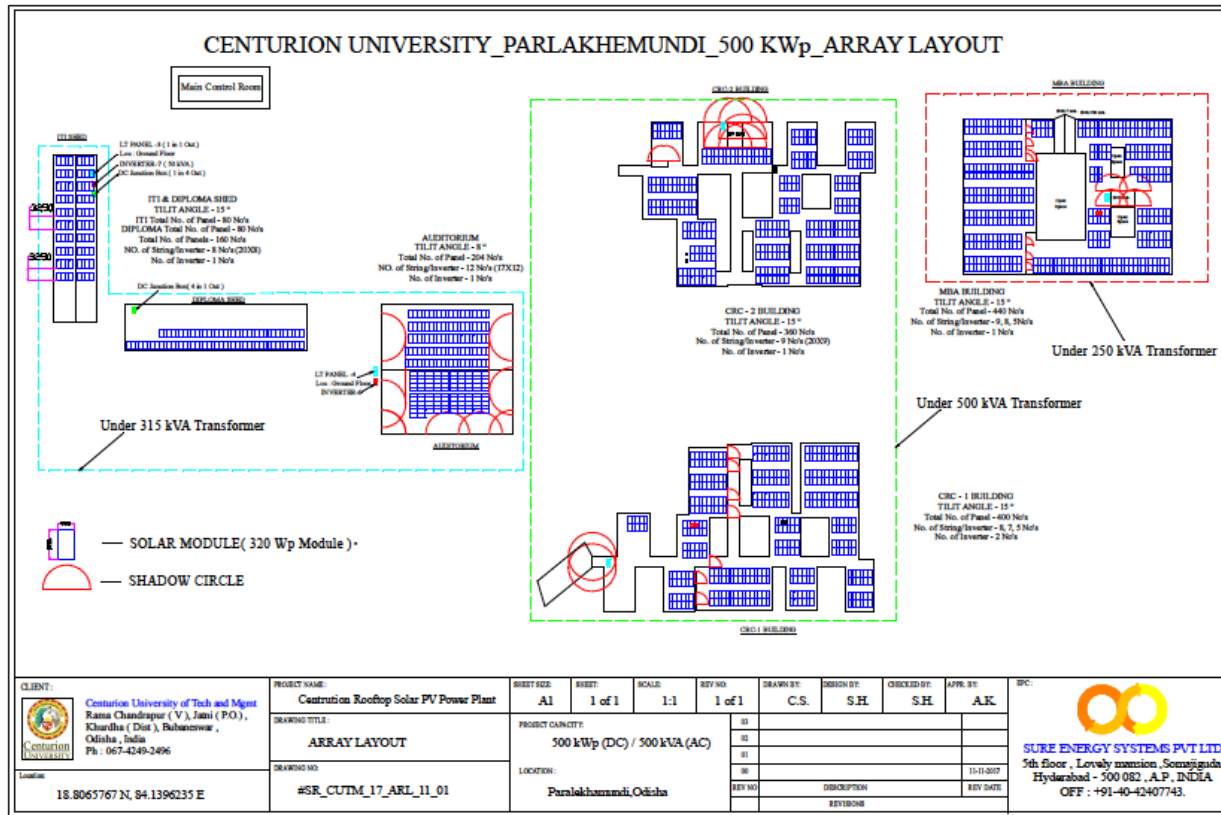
Solar Panel Earth Layout at CUTM- PKD campus
